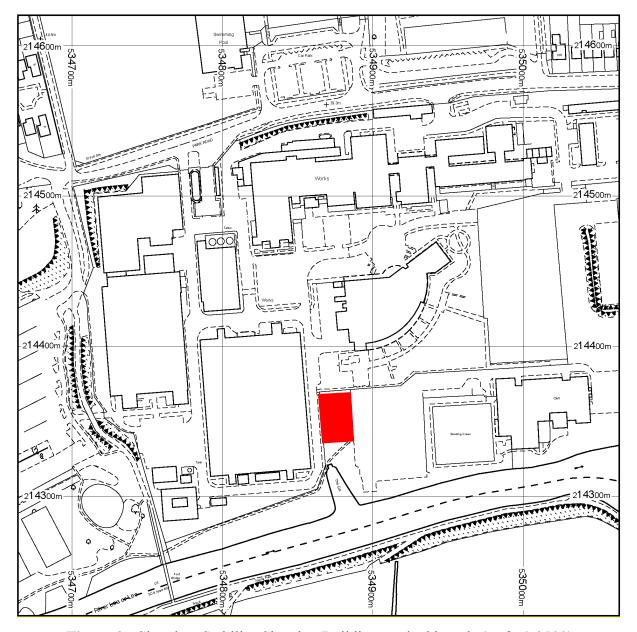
Site plan. Stability Chamber Building marked in red. (scale 1:2500)
